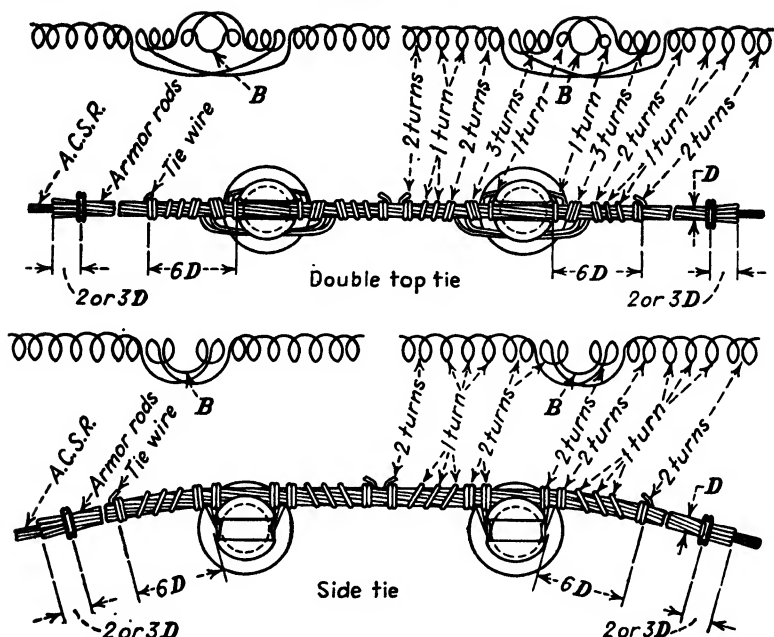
Double-pin-type insulator tie for ACSR aluminum cables equipped with armor rods. (Courtesy Aluminum Company of America.)
